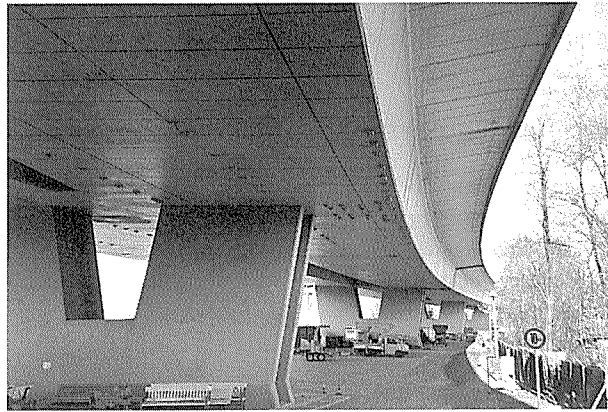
Prestressed Concrete Highway Bridge (Box Girders) in Berlin, being under Investigation for 6 Years now
